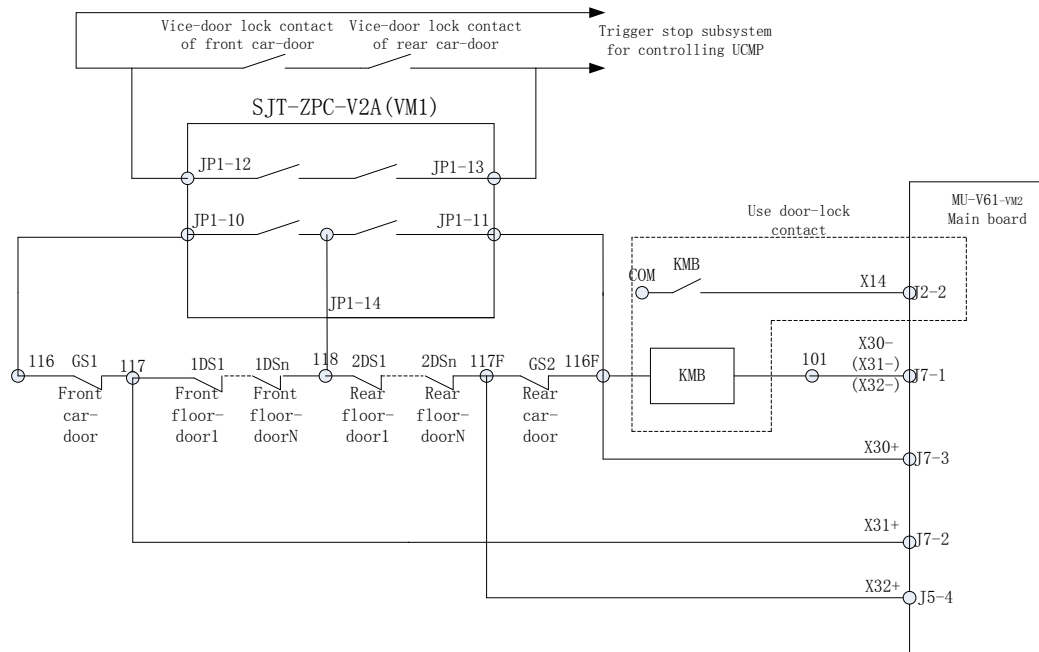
rear door mode: floor/car-door short connected detection plan (Suitable for asynchronous traction machine and combined with UCMP stop subsystem)
